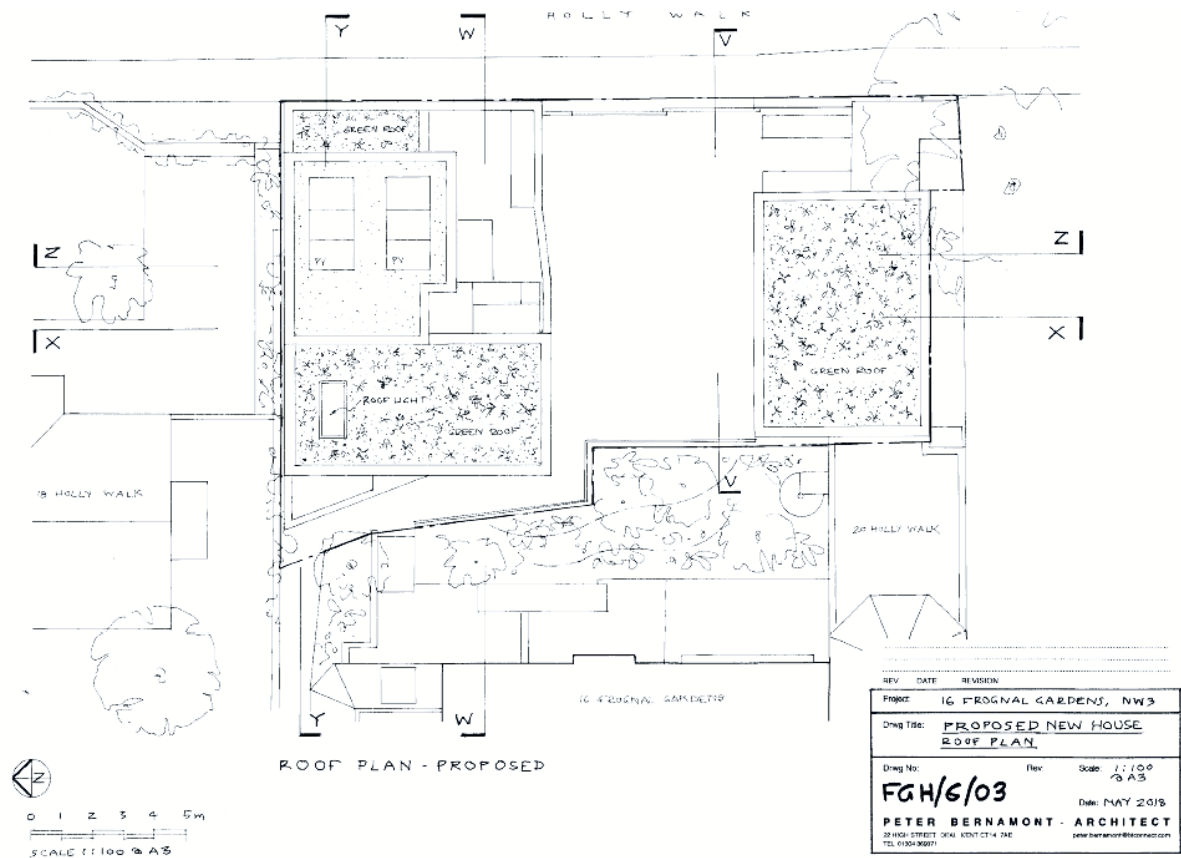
Floor Plans of the proposed Frognal Gardens residential development
